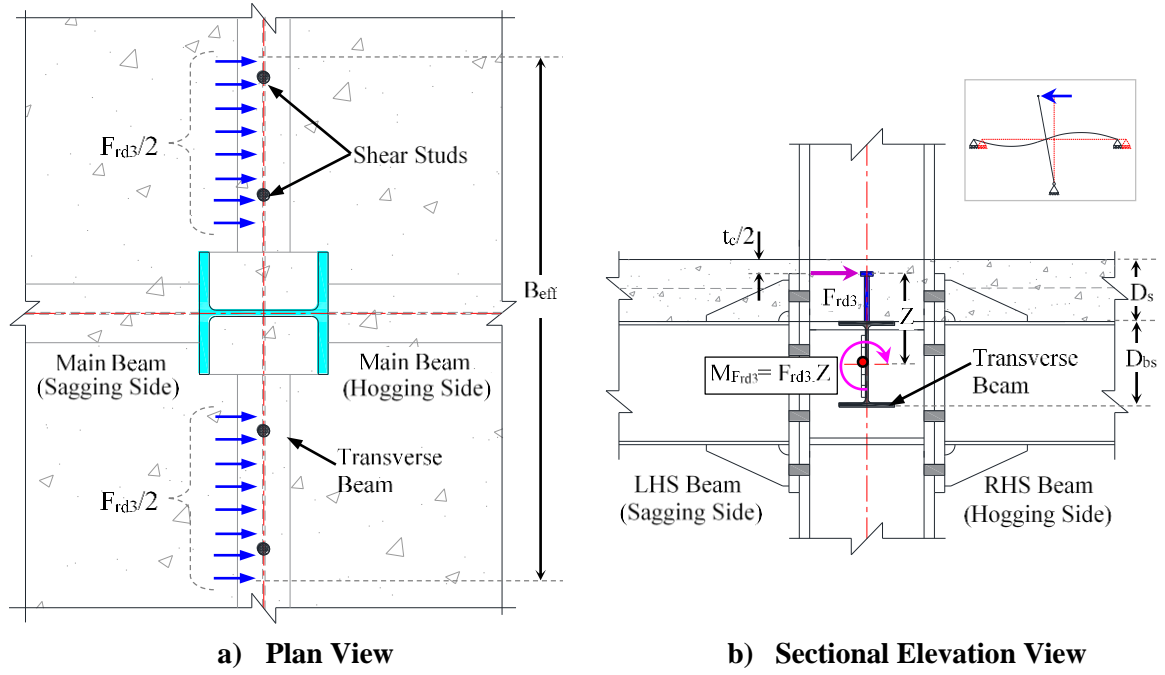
Slab Force Transfer on the Transverse Beam (Mechanism-3)
